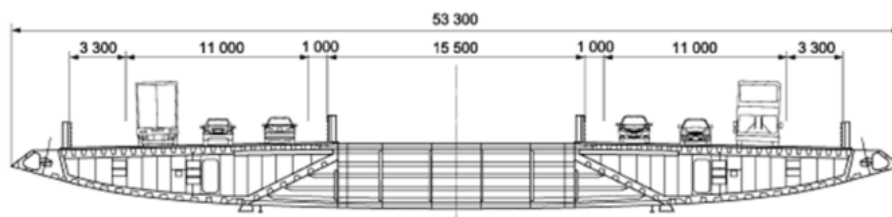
Cross-section of the bridge deck (Kaji et al., 2010)
